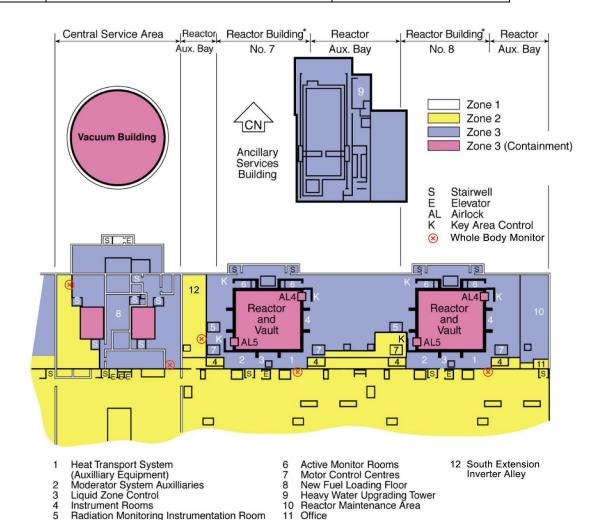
Plant zoning arrangement – floor plan at elevation 615 ft
